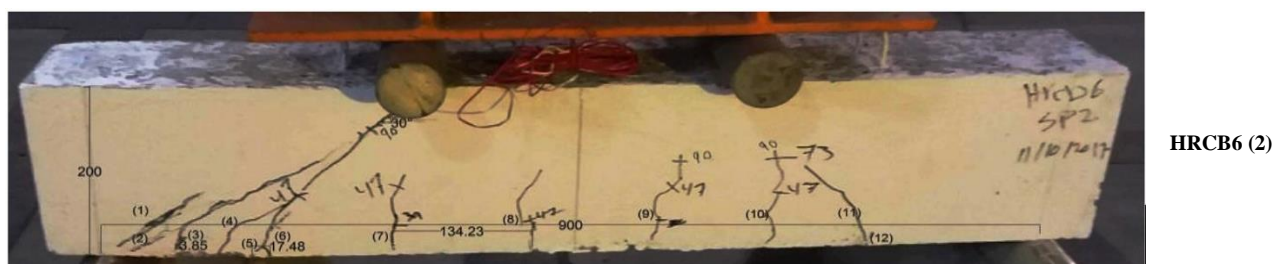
b) Crack behaviour of hybrid rubberized concrete beams
